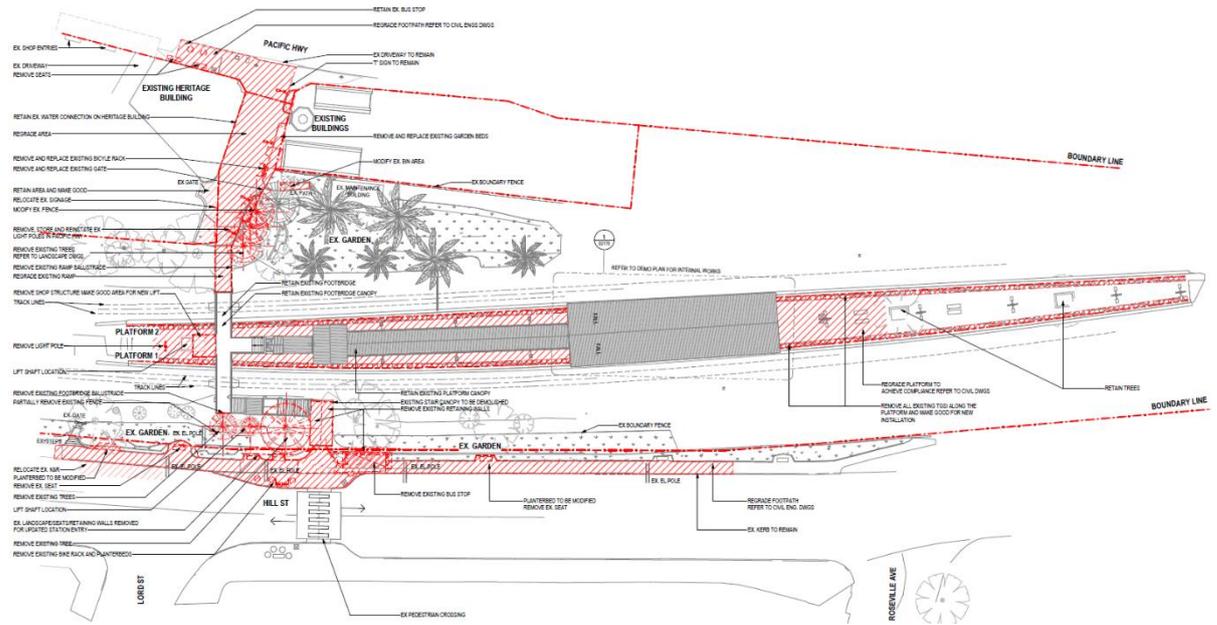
Excerpt of existing demo plan. (Source: DesignInc)
